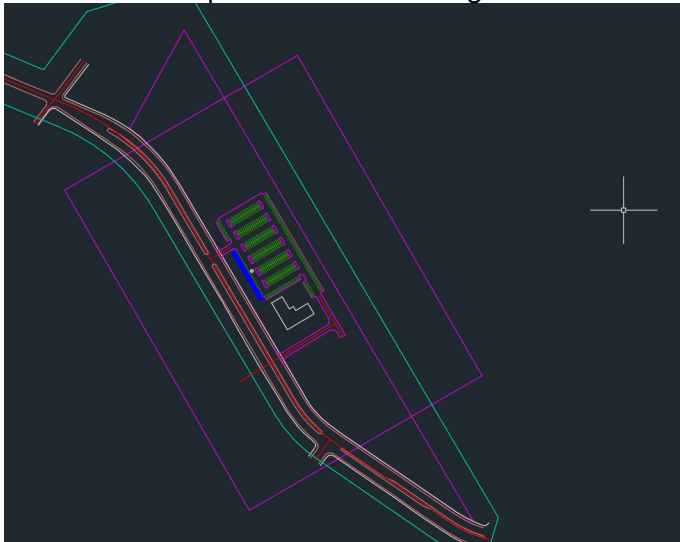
Layout rectangle moved and rotated into place to represent the visible area of a site plan sheet.
